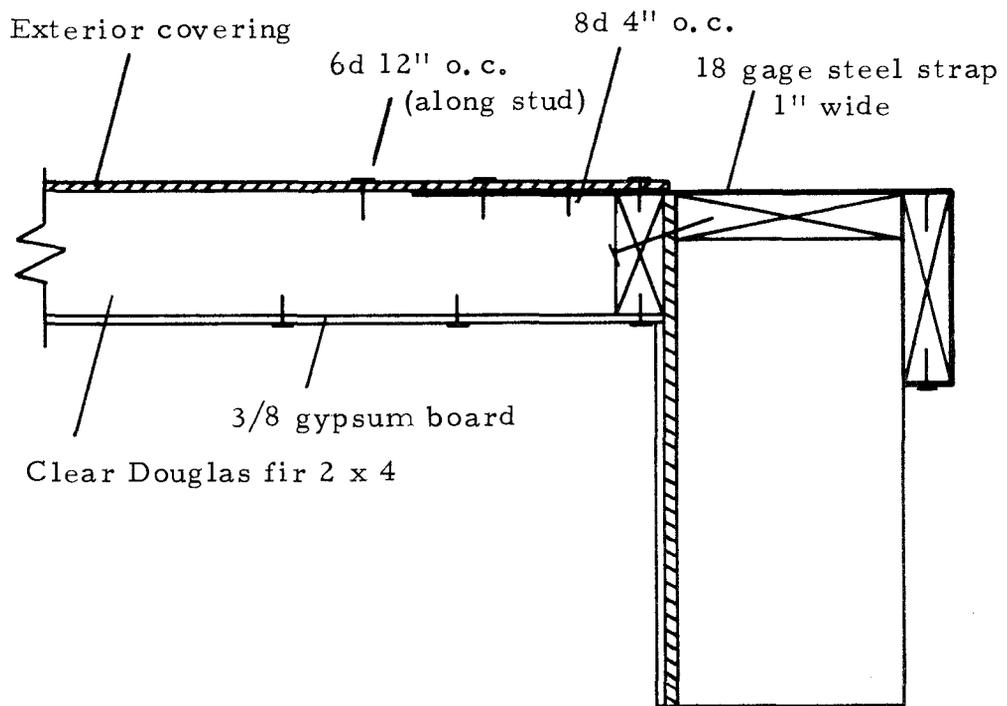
Wall construction type III where exterior covering does not overlap joist header and wall is tied to floor with a steel strap.
